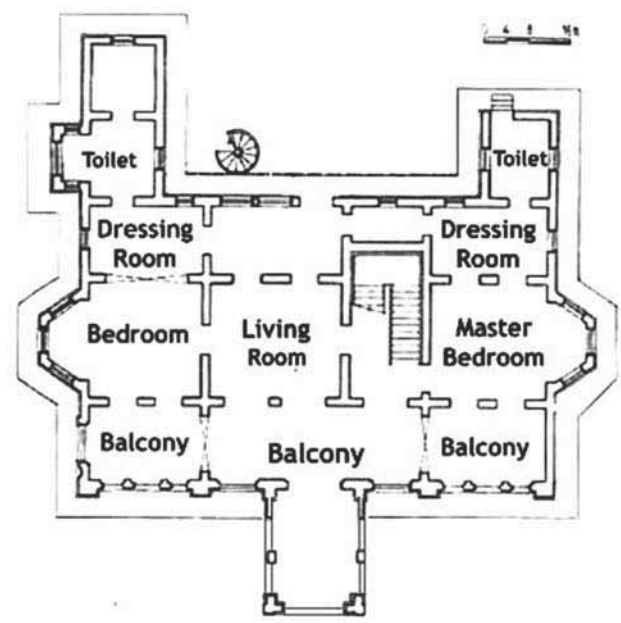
First Floor Plan of Flag Staff House, Karachi.
